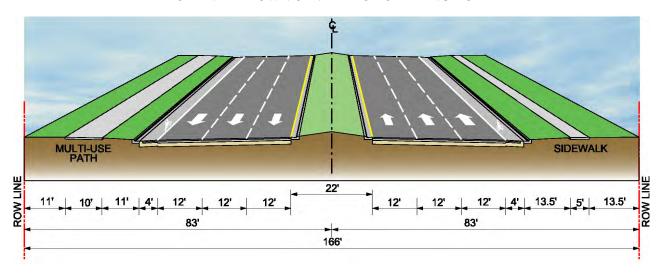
SIX-LANE DIVIDED URBAN TYPICAL SECTION FORT KING ROAD TO US 301
